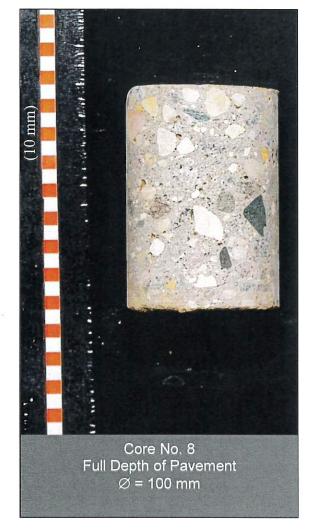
Specimen from Fernwood Avenue, Westbound Lane
